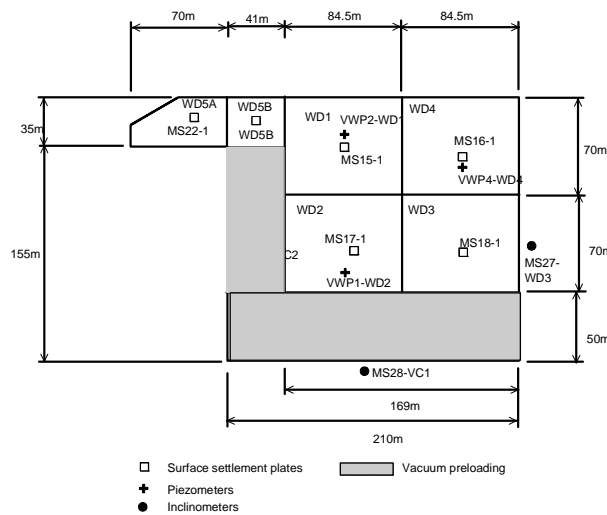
Site layout for S3A with instrumentation plan (Data Source: Indraratna et al. 2011)
